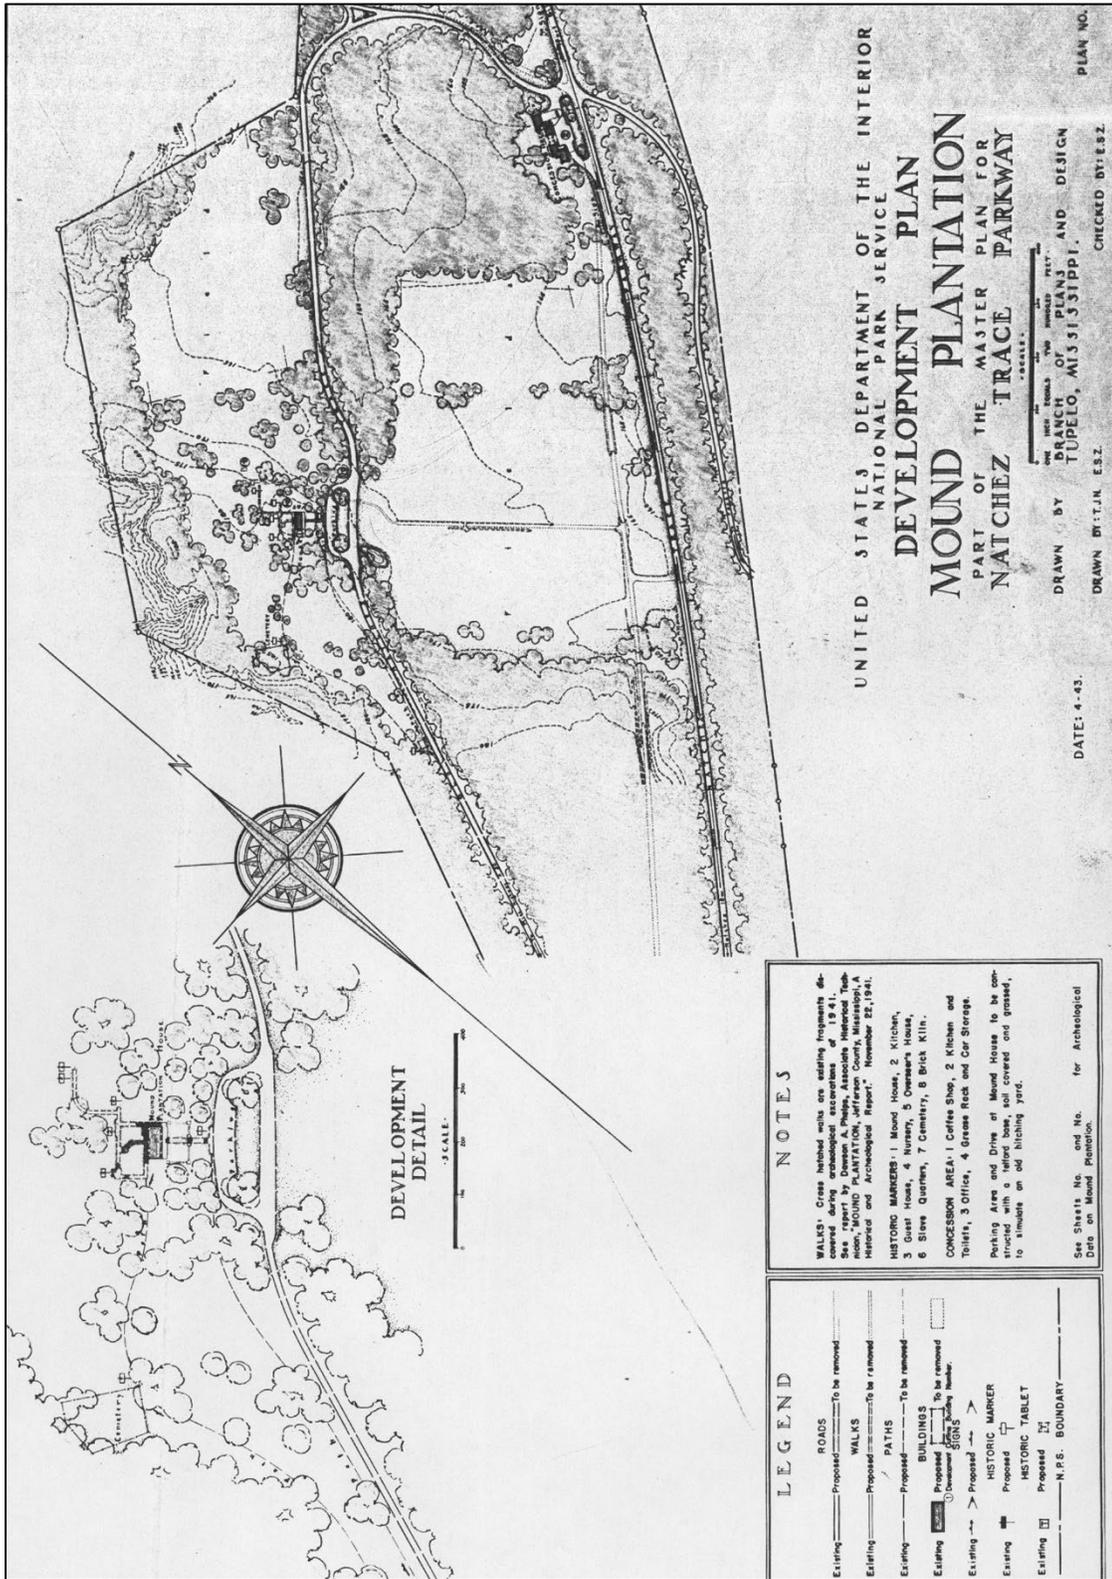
Development Plan, 604/2281, Mound Plantation, 1943. (NATR archives)
